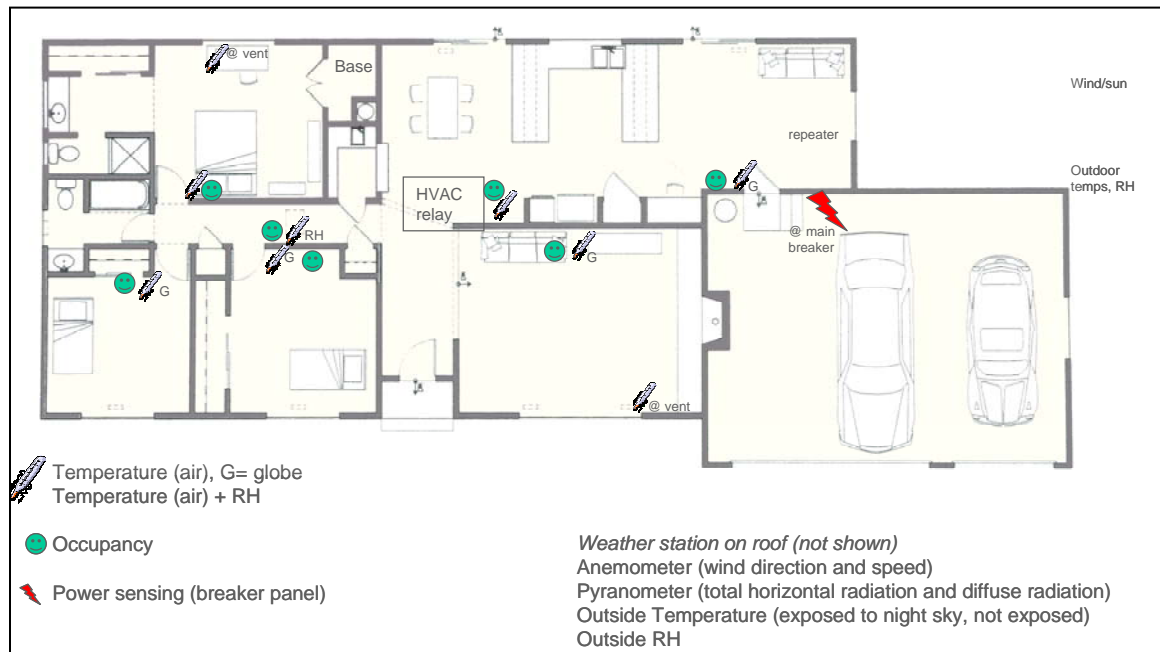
Floor plan of first field test house in 2005, showing type and location of motes.
